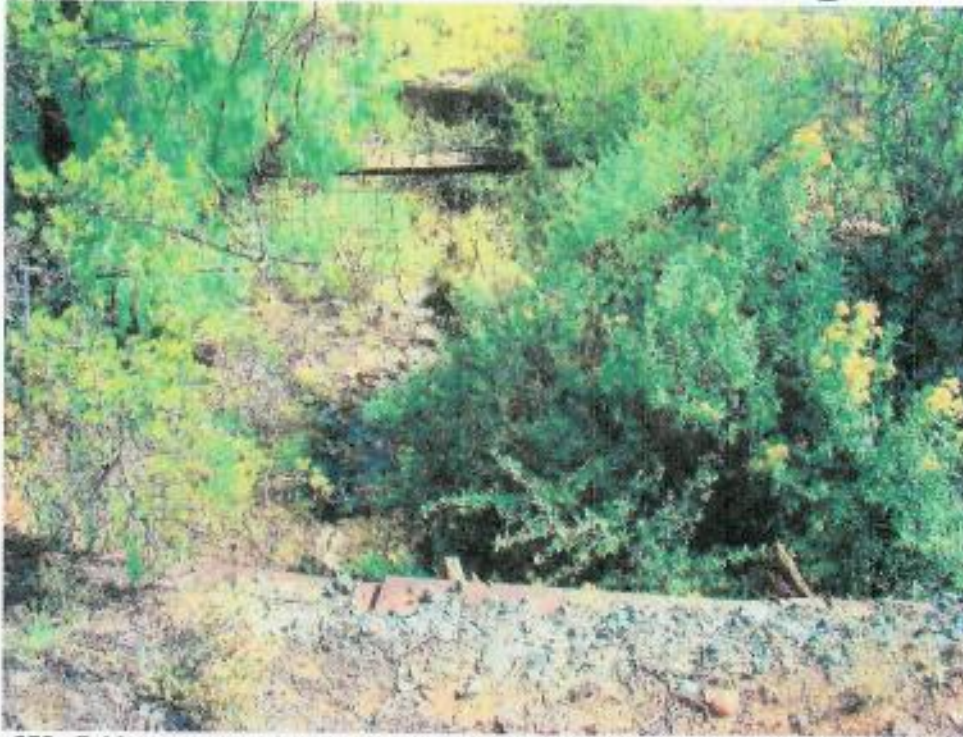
Bridge constructed of wood, metal and cement (orientation from bridge towards south)
